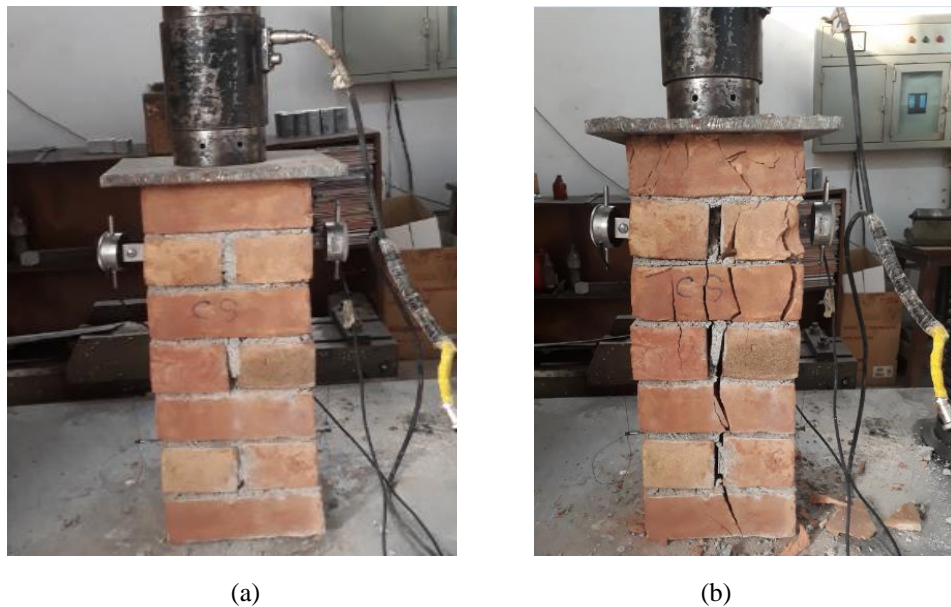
Testing of Brick Masonry Prisms in UTM. (a) Showing Prism before testing (b) showing prism after testing
